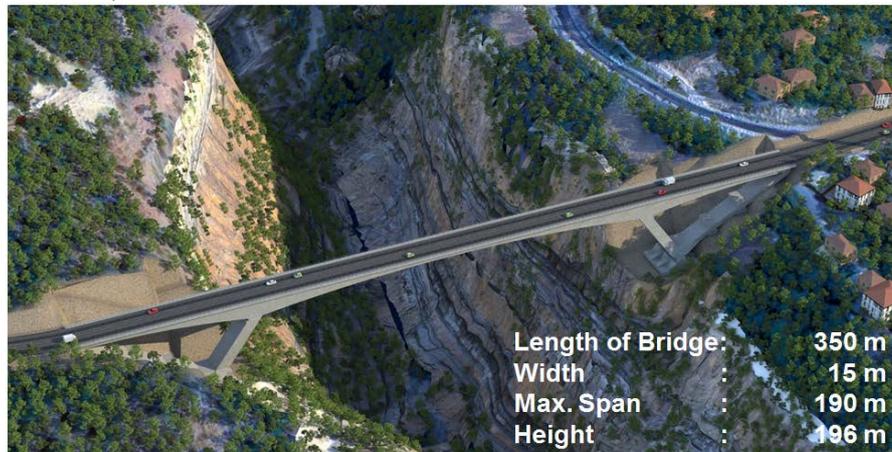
A rendered photo of Çamlıca Bridge and the valley passed over.
